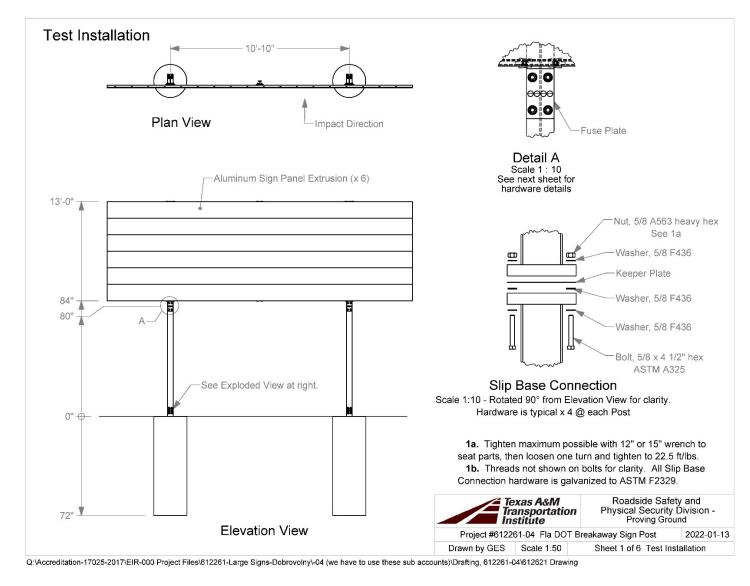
Details of Large Sign Slip Base Support for Crash Tests 612261-04-1.
